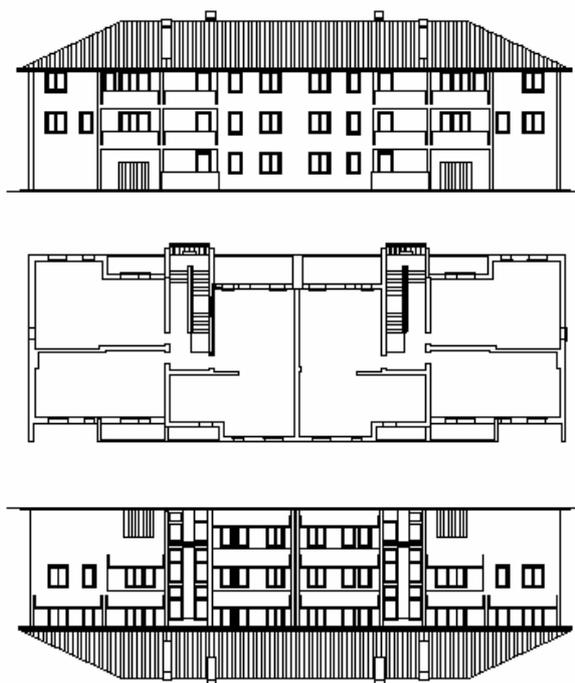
The examined building, plan of a typical floor and elevation of two principal facades.
